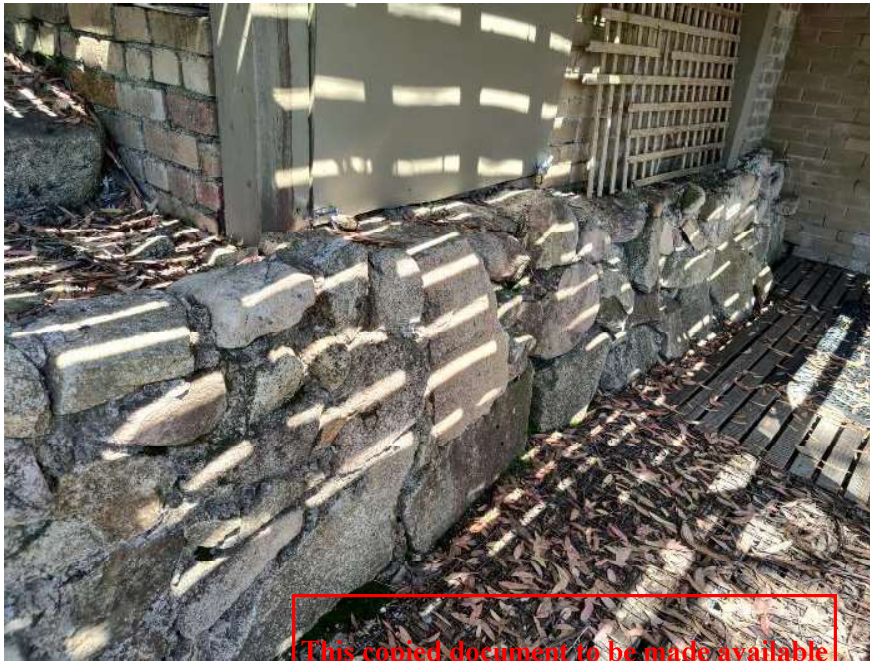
Eastern side at front of property looking west. Rock wall showing no evidence of distress.
